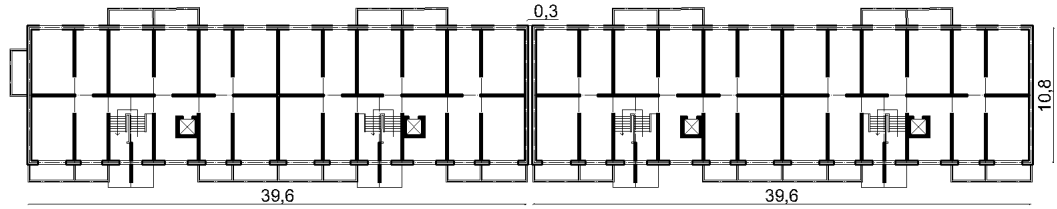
Plan view of building 37, showing the adjacent block. In our assumption, a connection 30 cm wide is present between the slabs at each floor.
